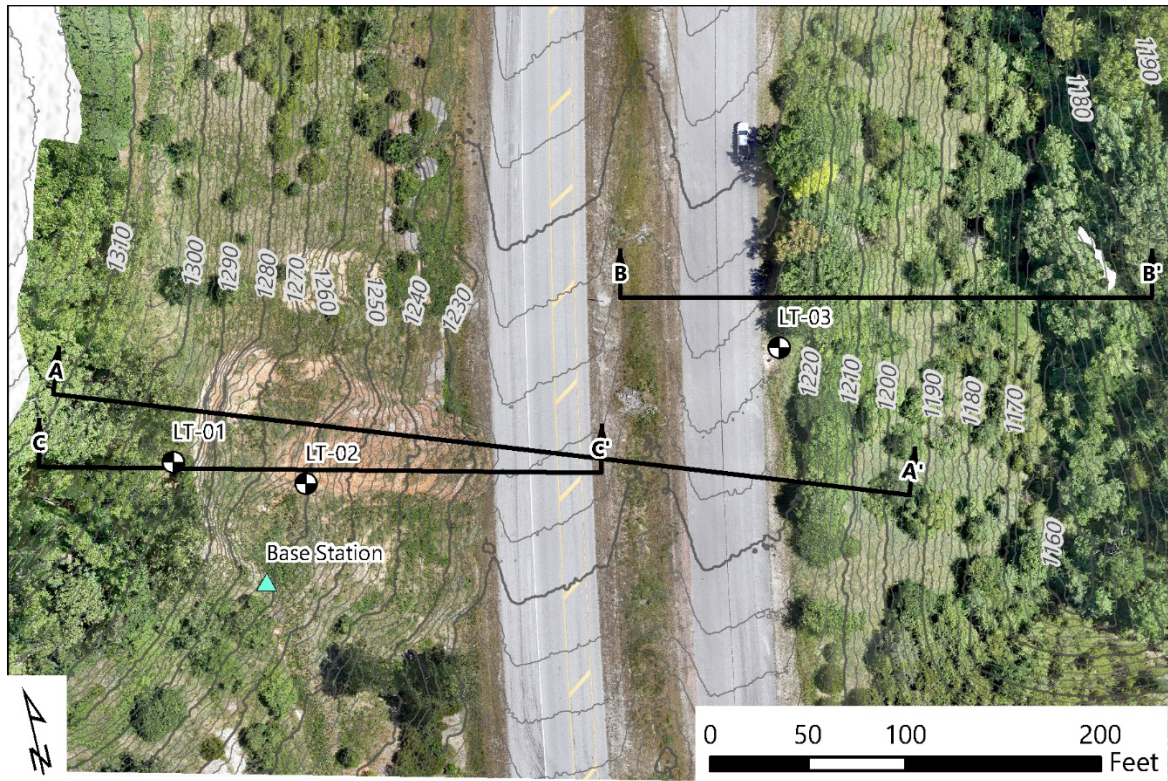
Site Plan showing location of borings and weather station installed at Ozark Mountain Highroad landslide.
